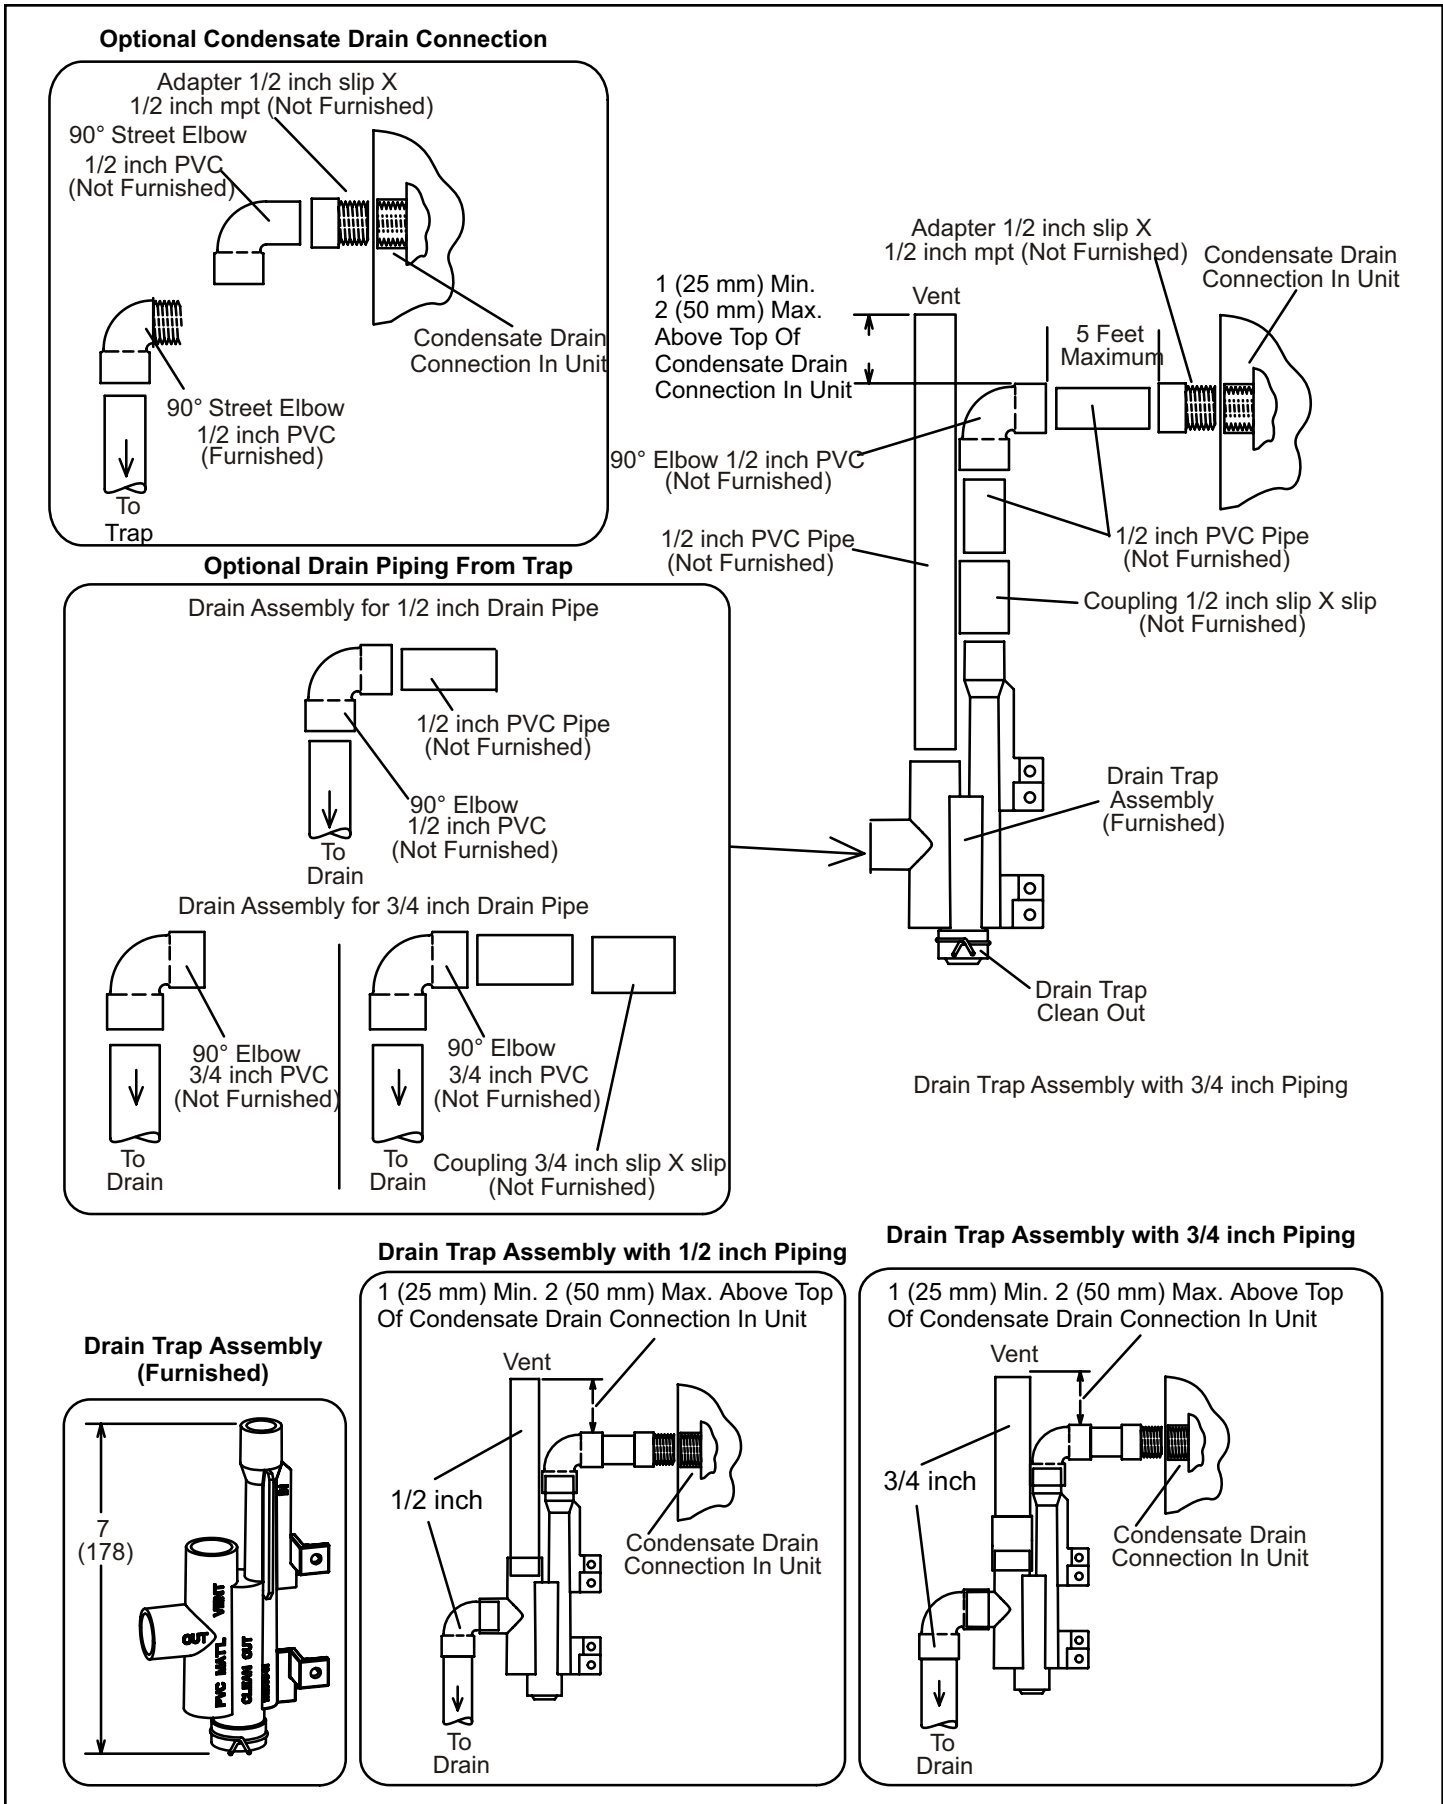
Trap / Drain Assembly Using 1/2" PVC or 3/4" PVC Cold End Header Box with 1/2 Drain Connection
